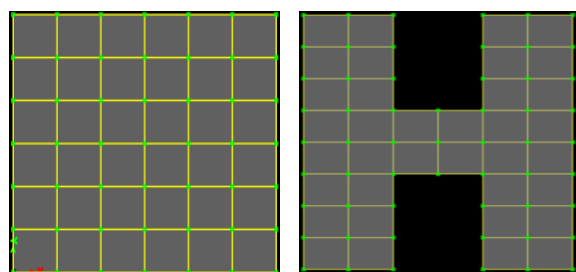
Plan of H- Shape Structure with shear wall 1(left) and shear wall 2(right)
